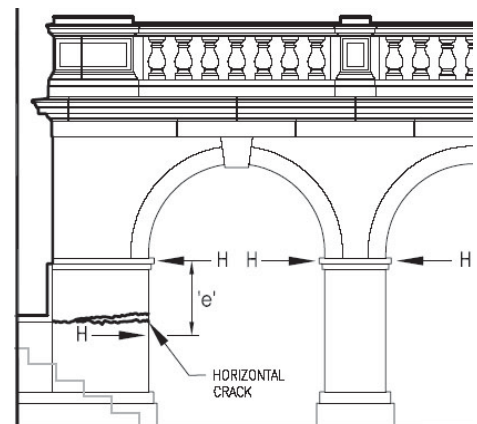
On both the east and west arcades a horizontal crack has formed at the grade level of the Lawn.
